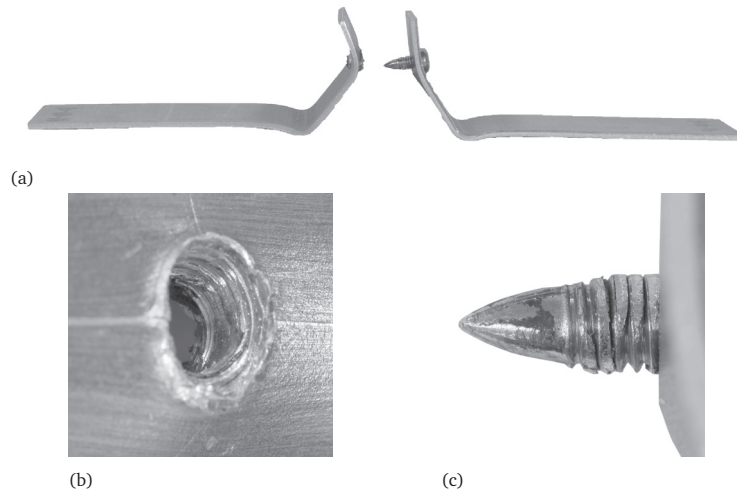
Deformed peeling specimen. (a) Whole specimen. (b) Top side of bottom sheet. (c) Screw.
